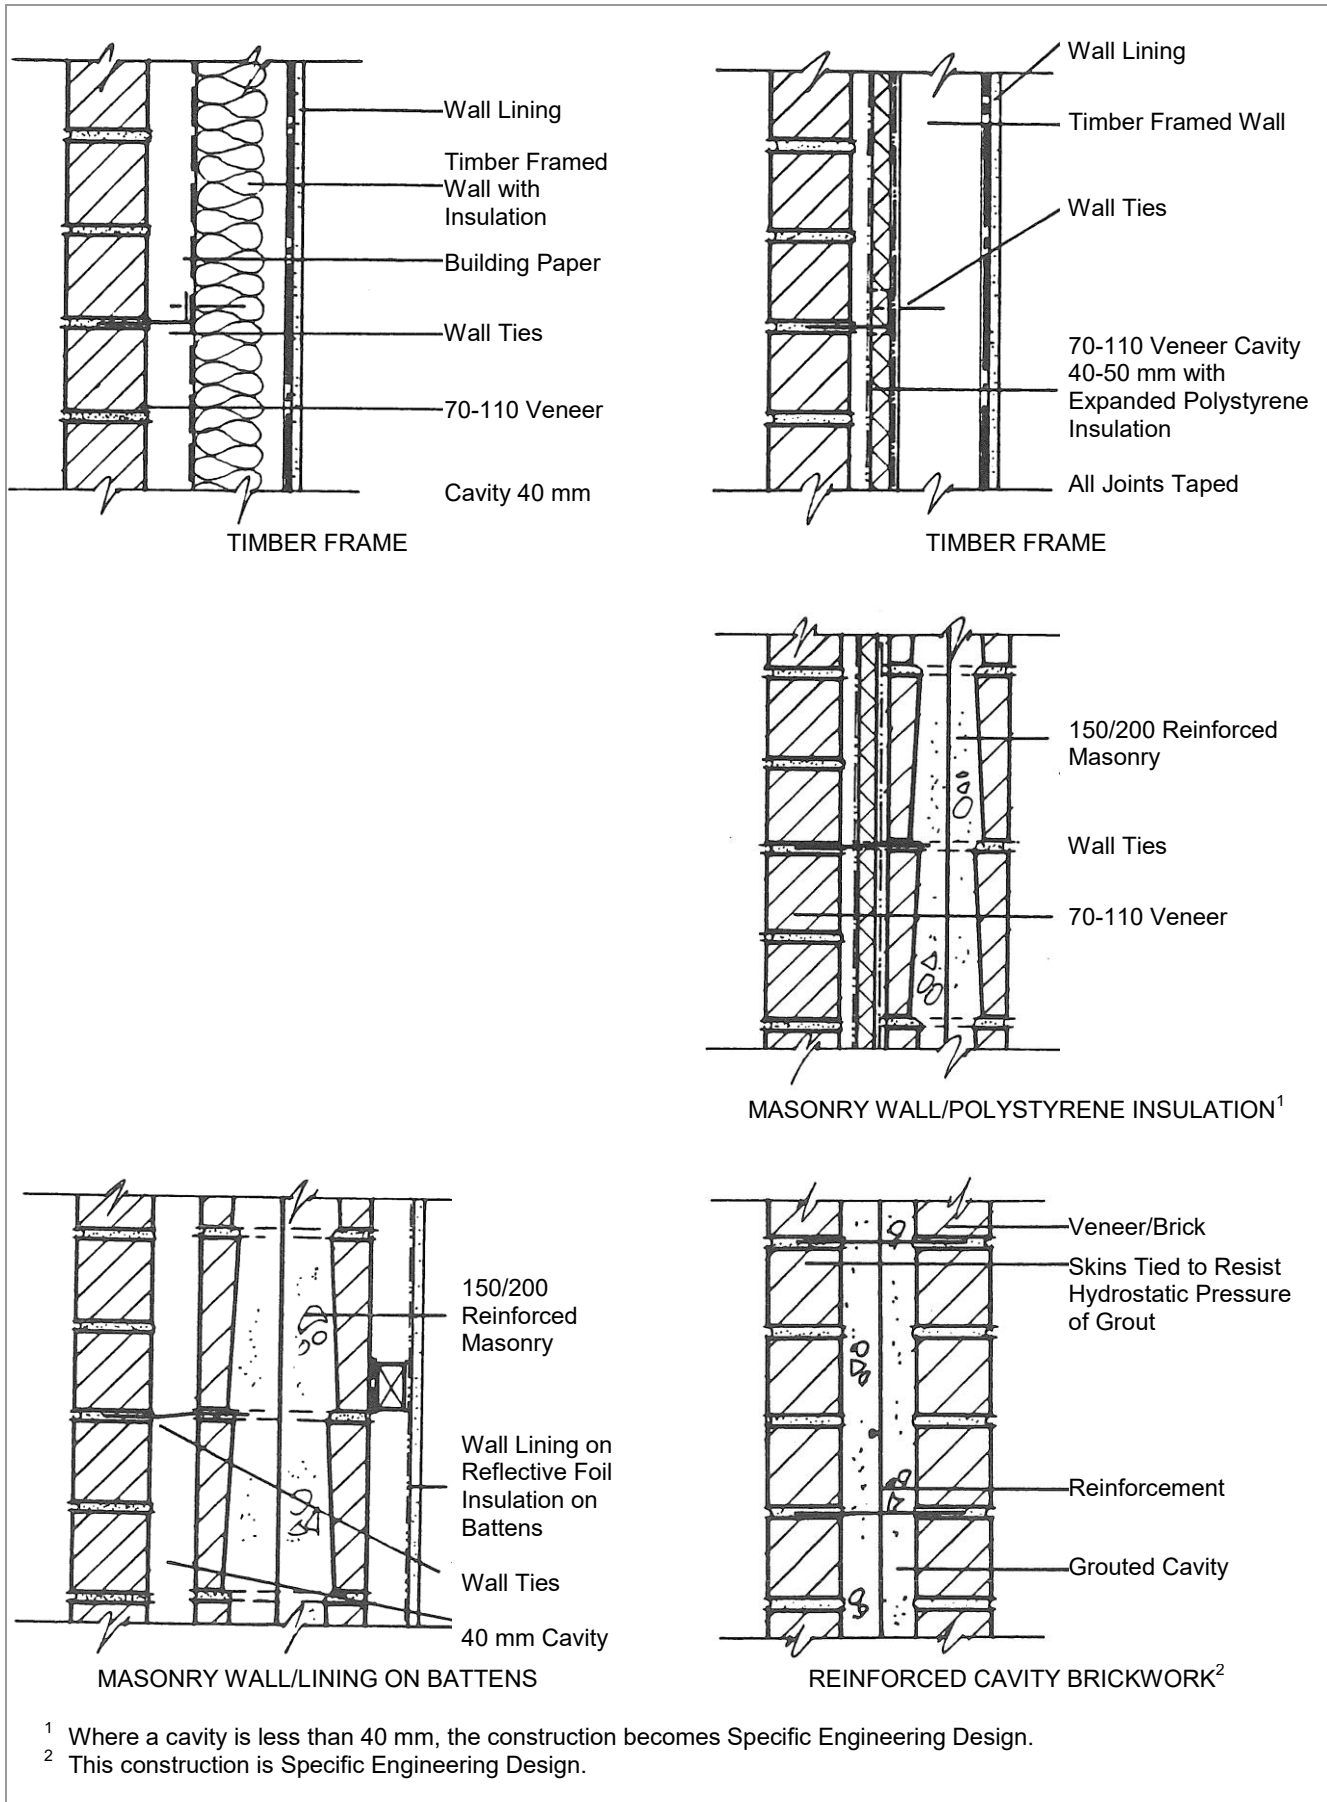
Veneer Walls – Range of Typical Veneer Construction
